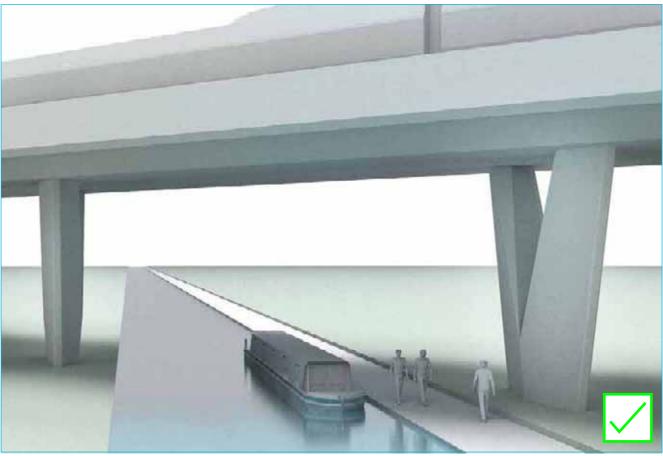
Waterway piers should aim to diminish the railway 'scale' a pedestrian one
